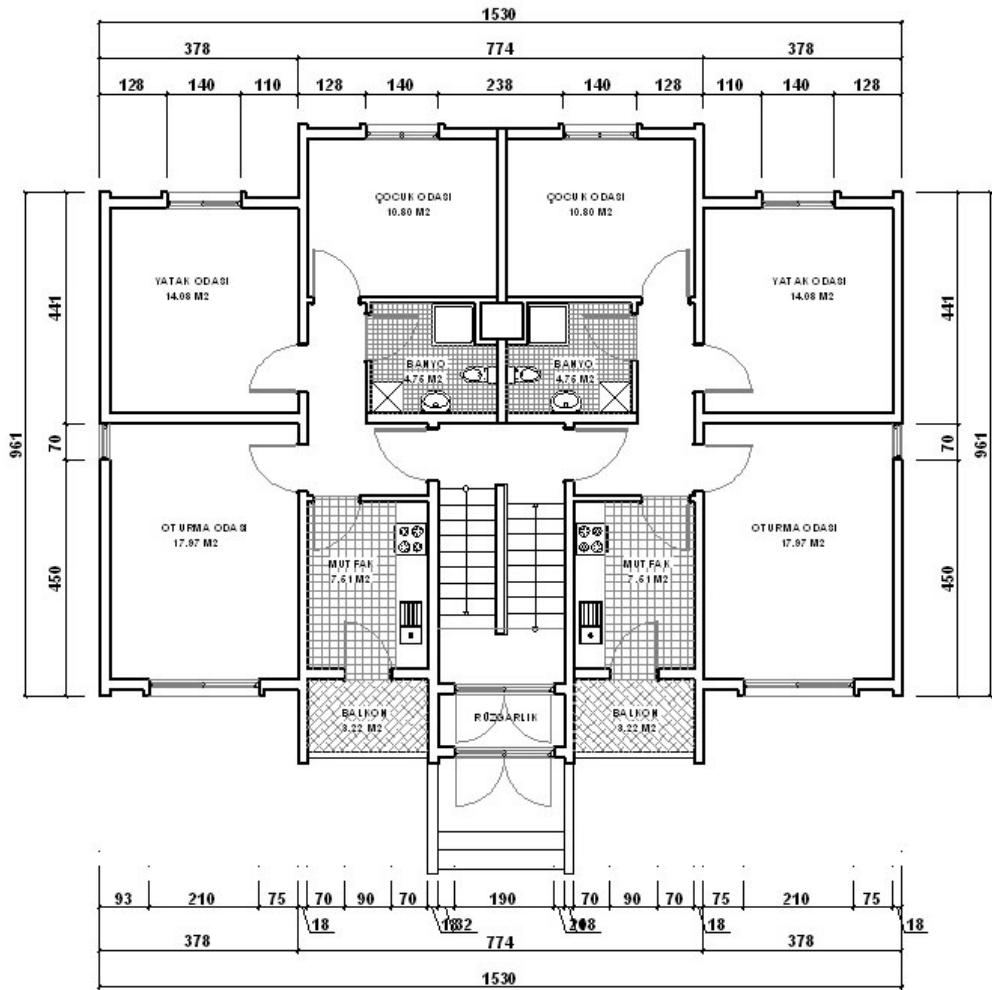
First floor plan of PIU MEER Project, Houses 'TYPE B'
